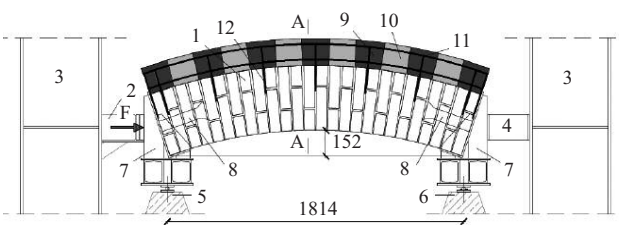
Diagram of the testing setup with a reinforced arch (LWS) using a reinforced concrete rib: 1 ÷ 8 according to fig. 1; 9 – monolithic reinforcement segment; 10 – prefabricated reinforcement segment; 11 – reinforcement; 12 – chemical anchor
